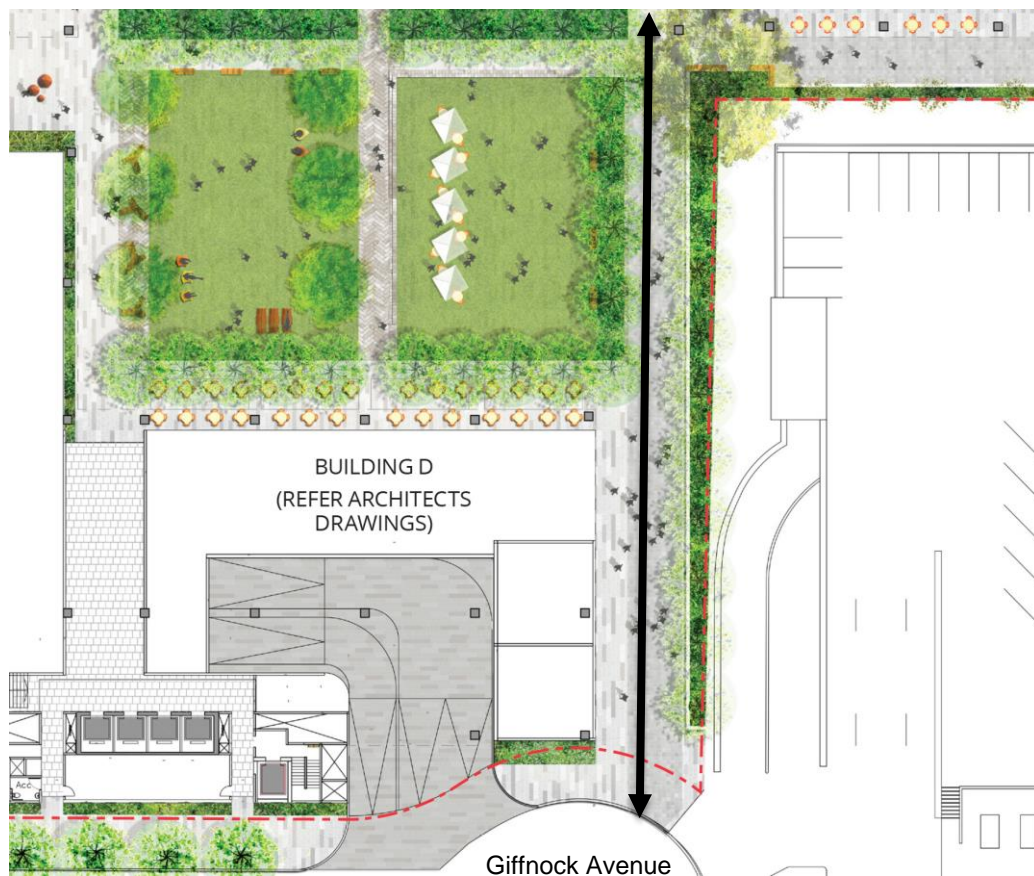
Proposed interface between Building D and the adjoining Hyundai site, showing the improved pedestrian connection
